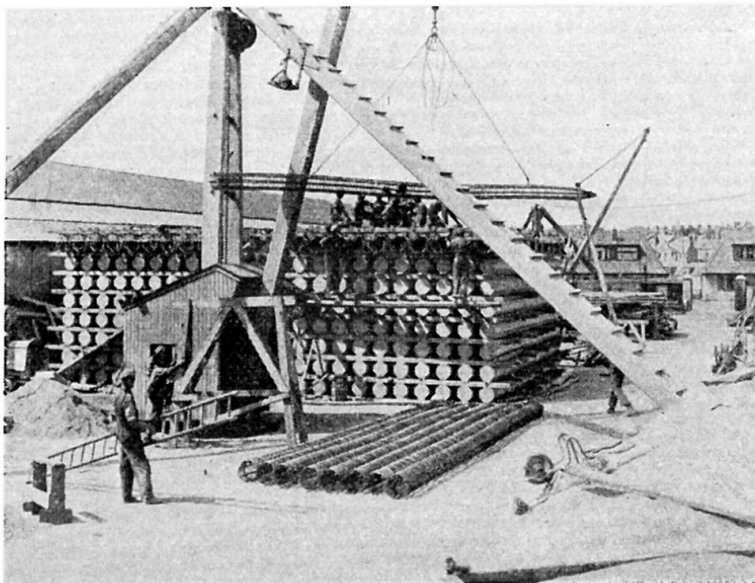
Fixing reinforcement for piles in casting yard showing stacking of piles.
